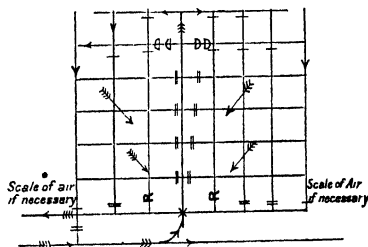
PLAN OF VENTILATION IN PANEL (GASSY).
